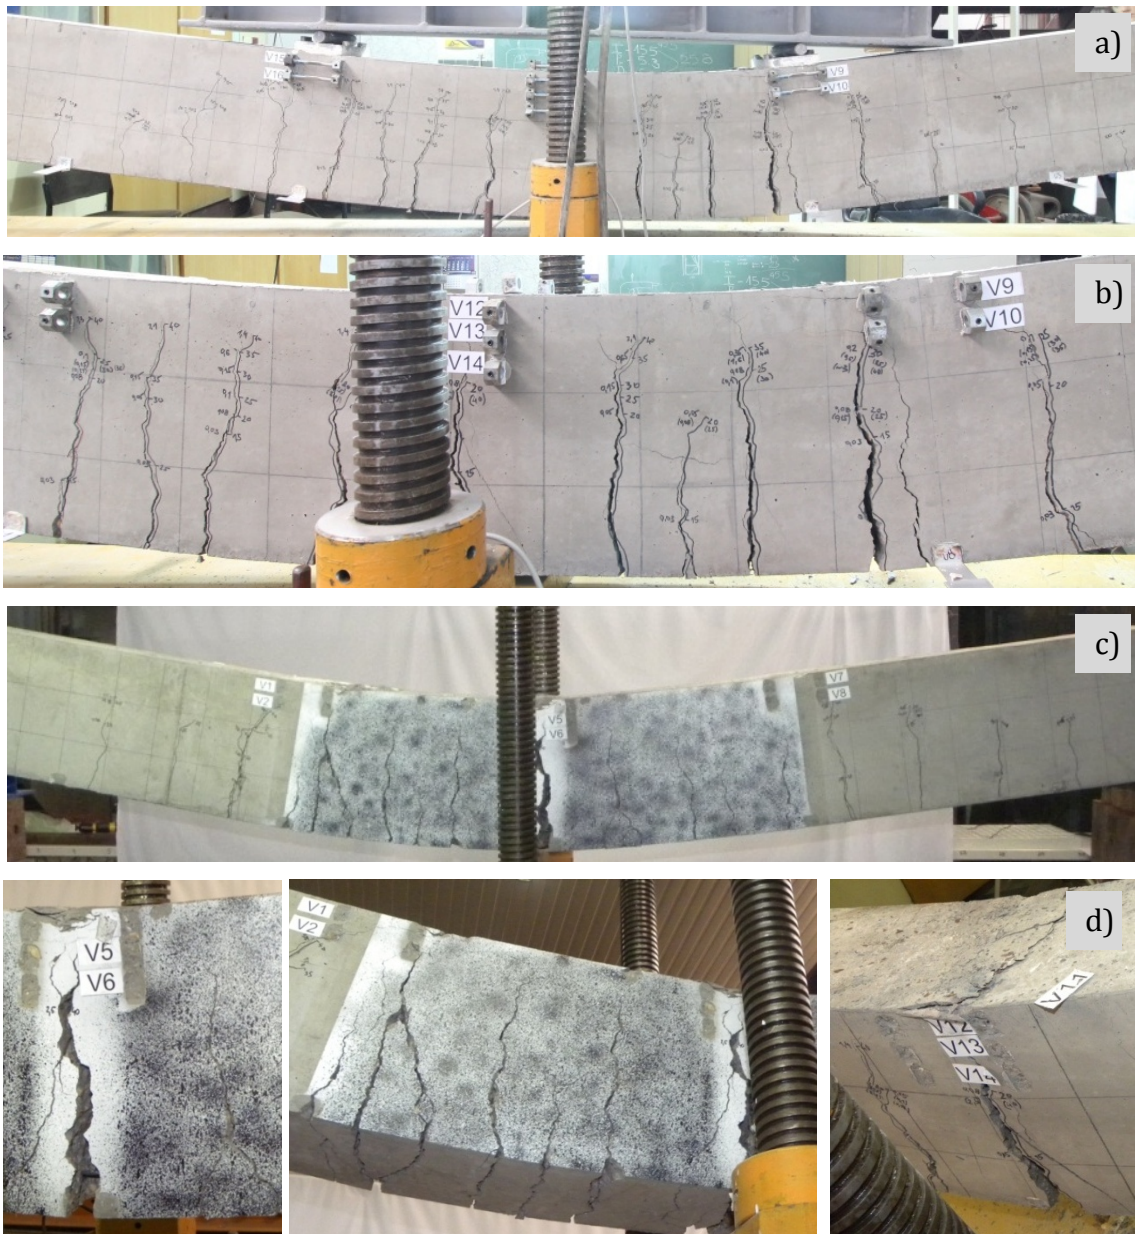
Crack patterns at failure load for HVFAC-1 beam: a) back side of beams' clear span, b) backside of beams' flexural span, c) front side of beams' clear span and d) front side of beams' flexural span
